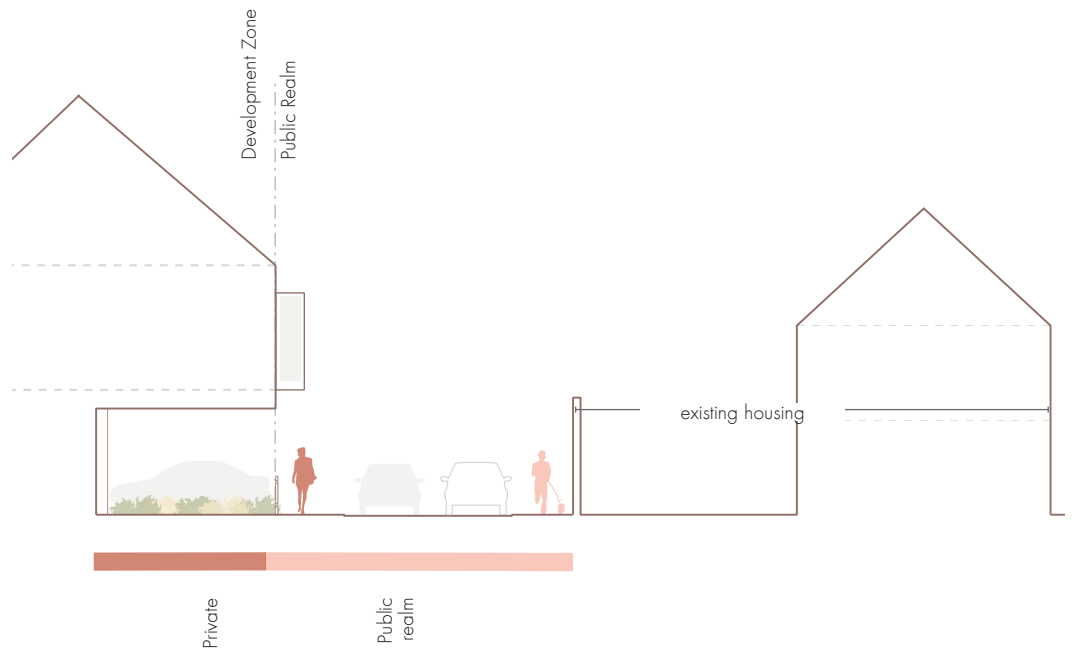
Illustrative section showing a possible arrangement for a mews typology on Carlisle Street
